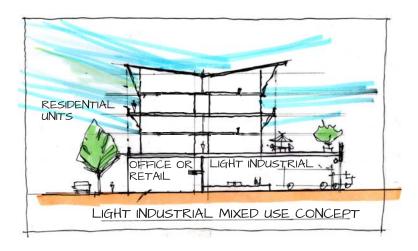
Example of a light industrial and residential mixed use building, showing how residential units might be set back from the loading areas.
